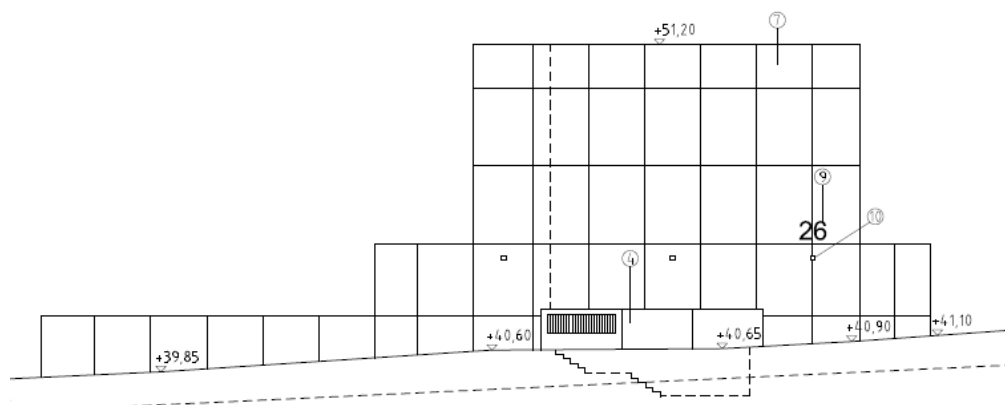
The location of the new wall luminaire on the façade gable, described with number 10 in the drawing. (Source: LKF)
